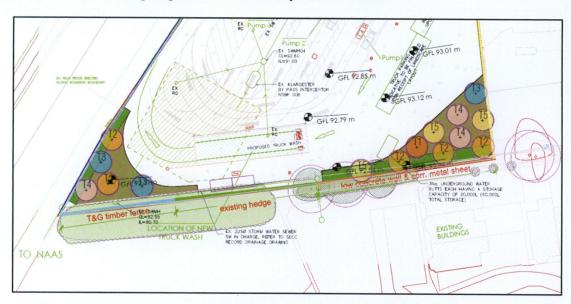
Extract from the landscape architect's plan showing the two new planting areas.
